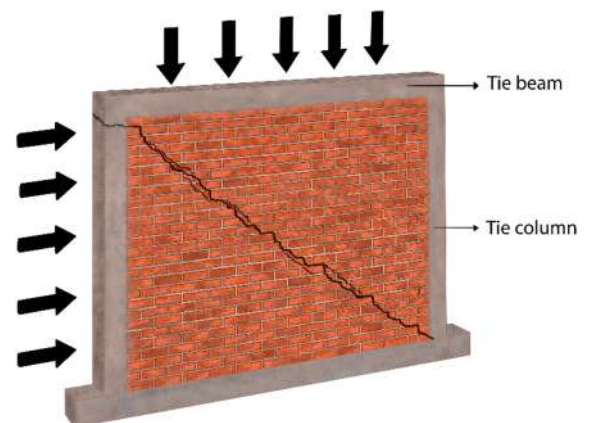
Diagonal compression failure mode in confined masonry (CM) walls and arrangement of reinforced tie columns and tie beams.
